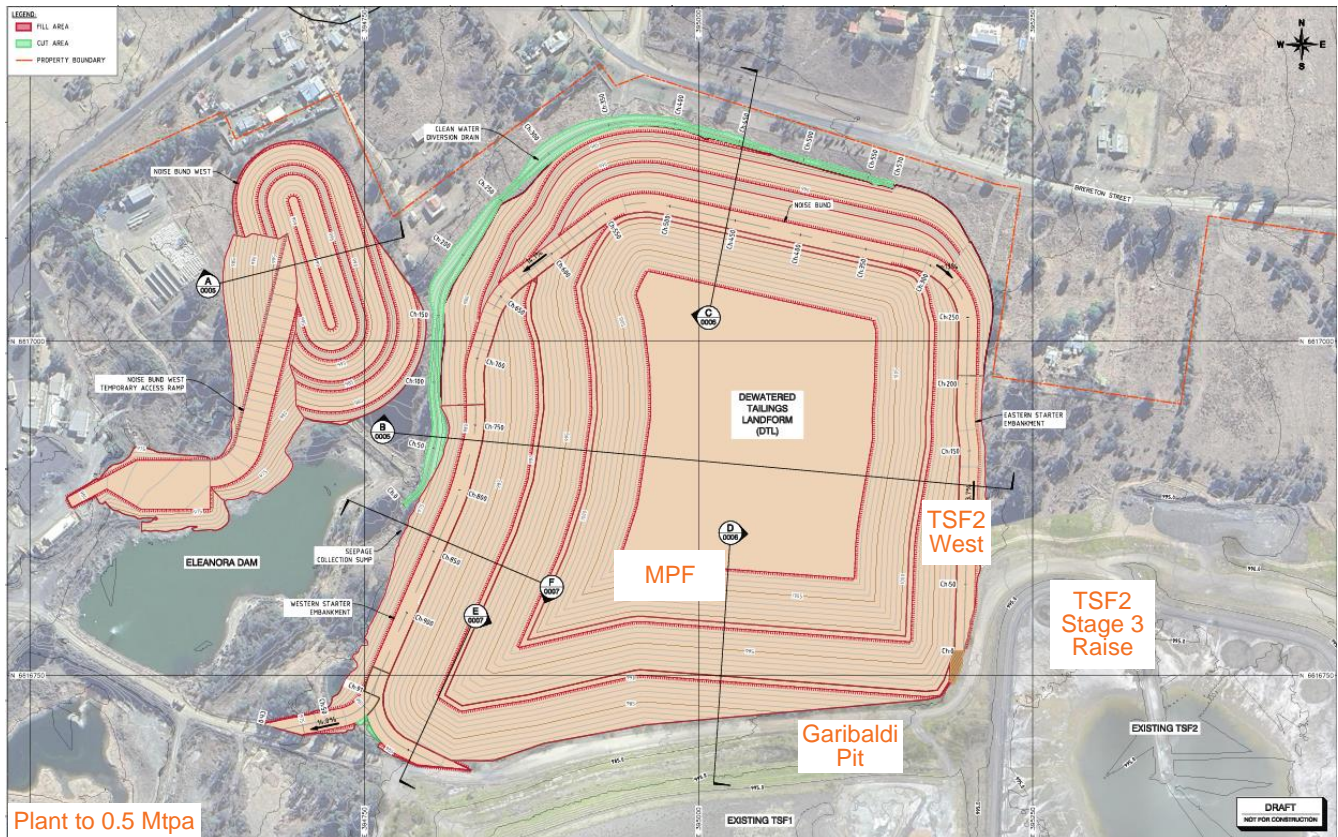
Dewatered Tailing Landform – Final Layout (All Stages)
